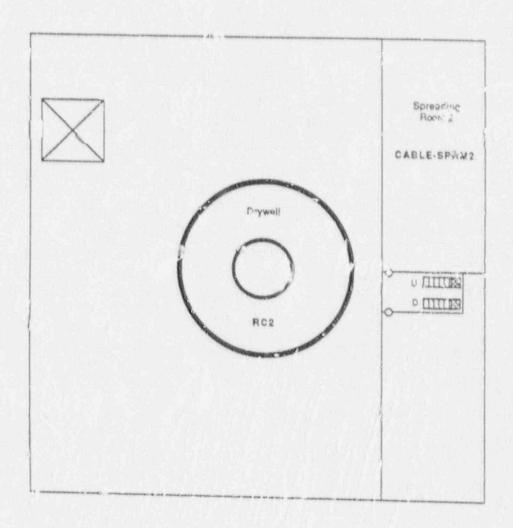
Browns Ferry Unit 2 Reactor Building - 306 ft. Elevation.
